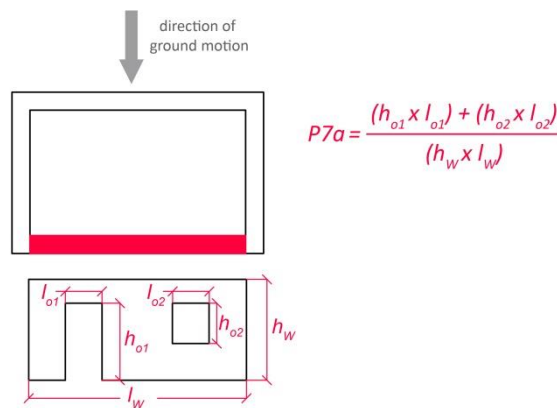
1: Definition of the ratio P7a concerning the area of wall openings in the walls perpendicular to the loading direction
